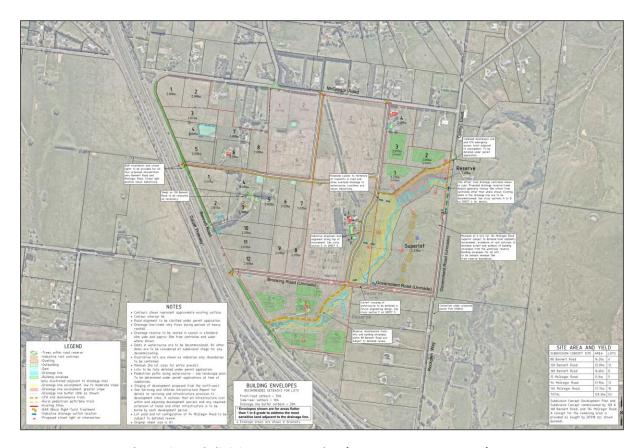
Subdivision Concept Plan (Image Source: Terraco)
